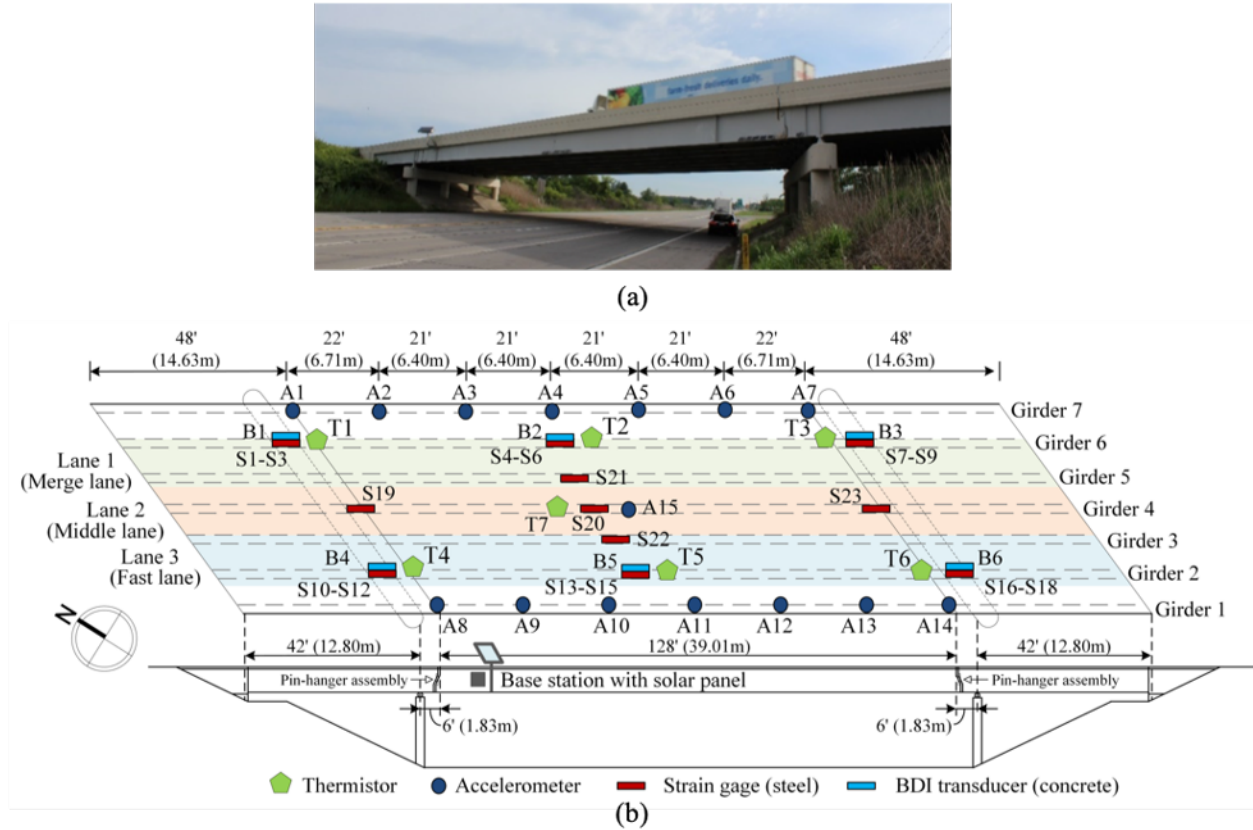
(a) Telegraph Road Bridge carrying I-275 northbound traffic over Telegraph Road; (b) overview of the wireless SHM system installed.
